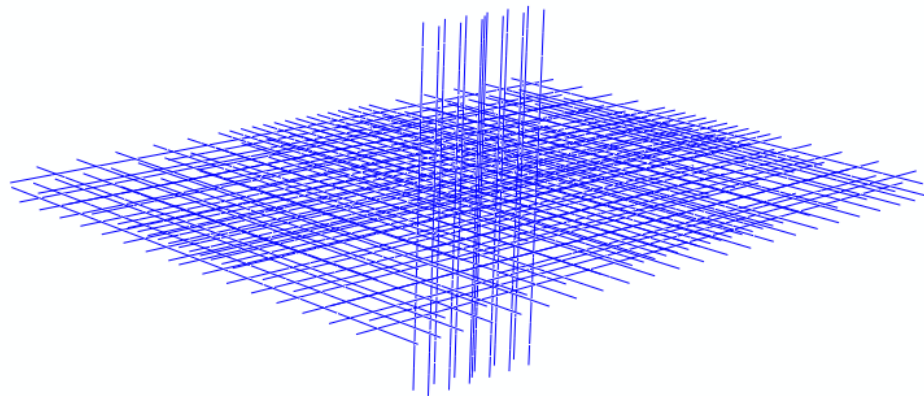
Typical top, bottom and column stub reinforcement for YL-L1 slabs
